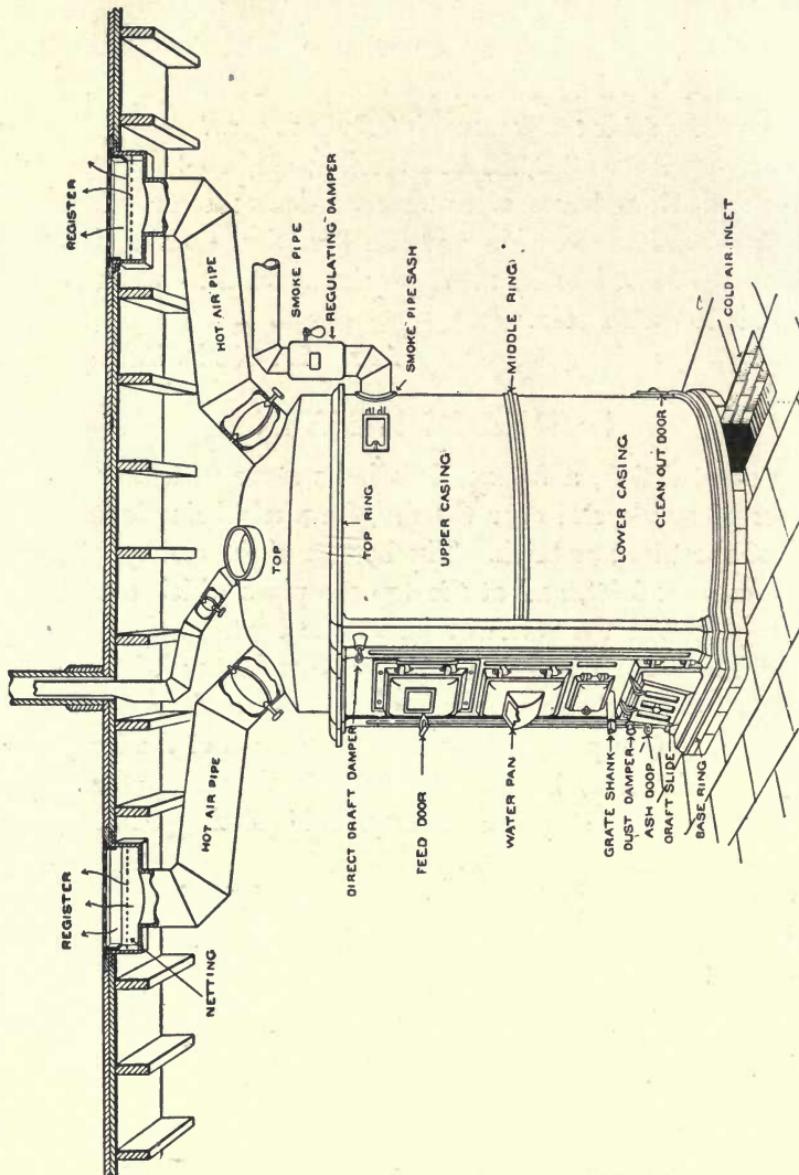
General Arrangement of Details of a Hot-Air Furnace, with Connecting Pipes.
